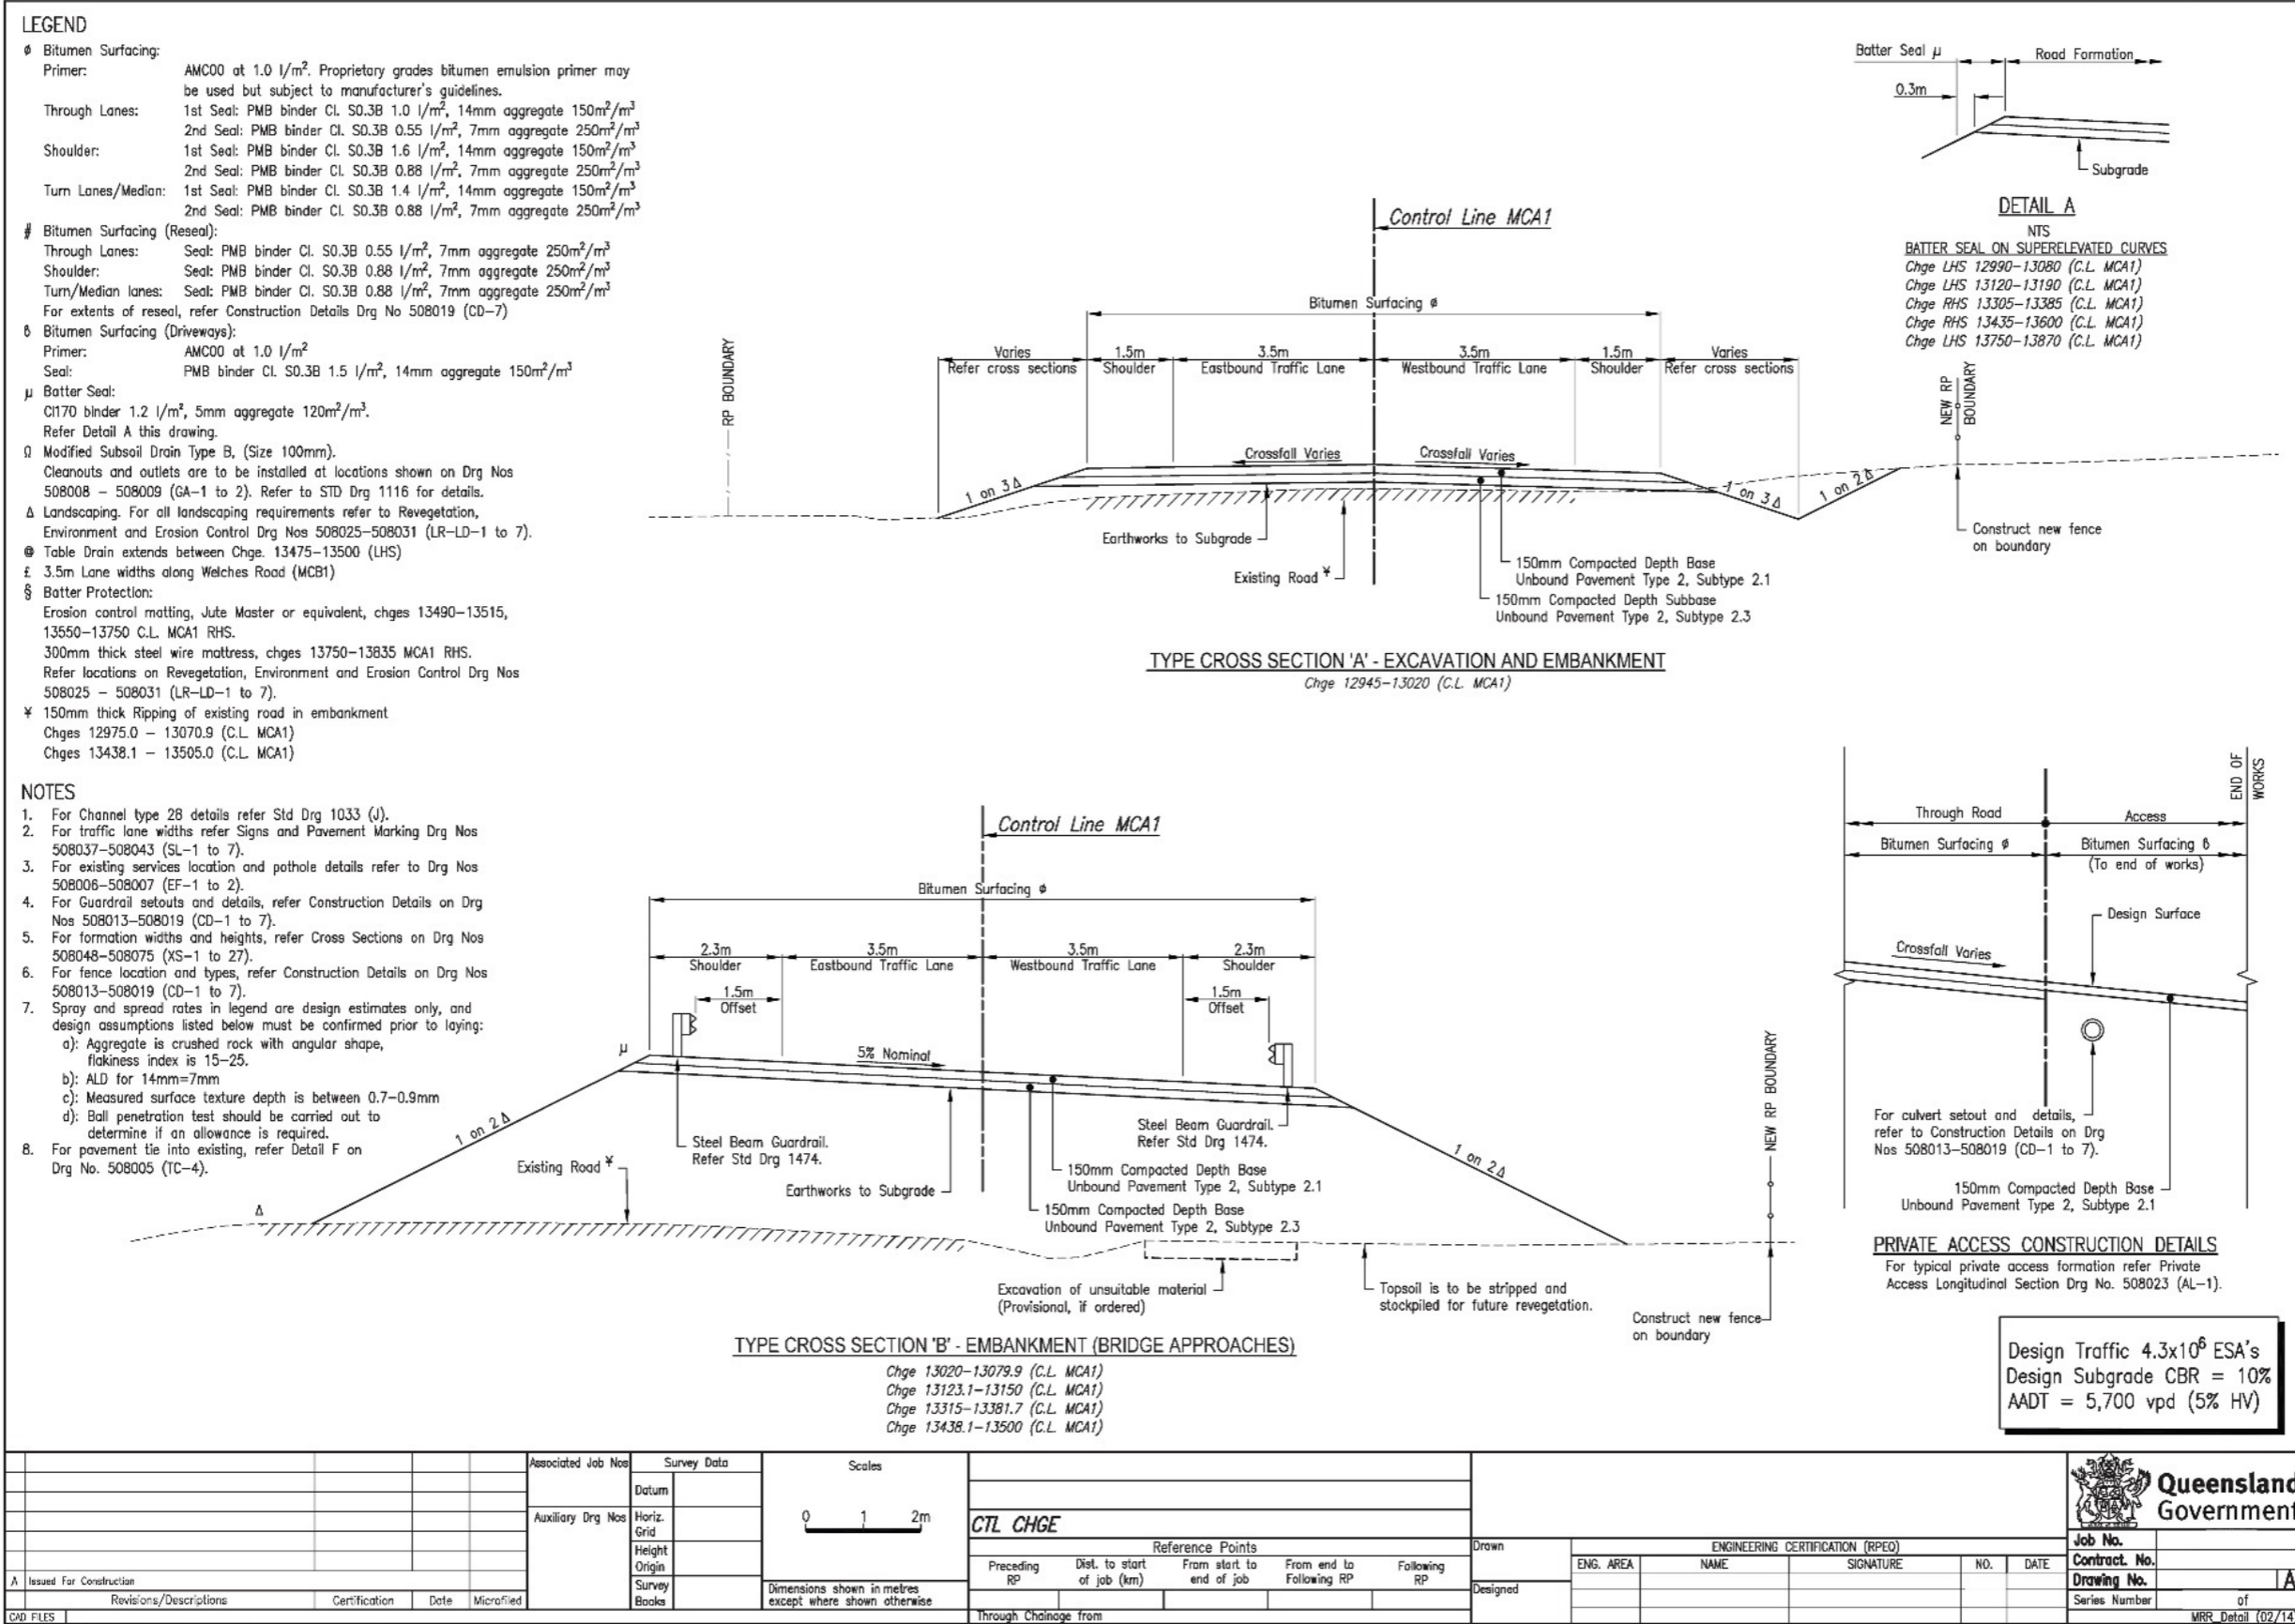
(b) – Type cross sections – generic example 1 – Sheet 2 of 2
